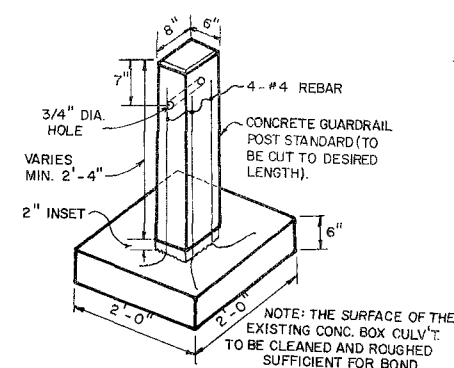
DETAIL OF GUARDRAIL POST MOUNTING TO EXIST. APPROACH SLAB
